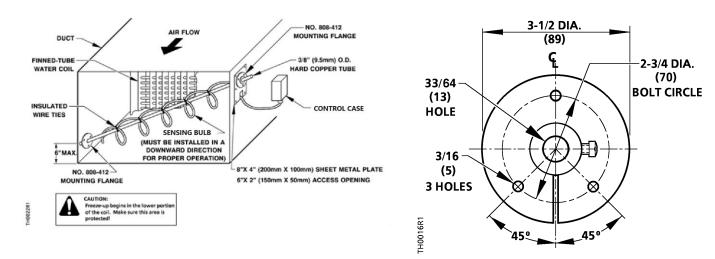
Bulb Mounting for Limited Access Ducts with Mounting Flange.
